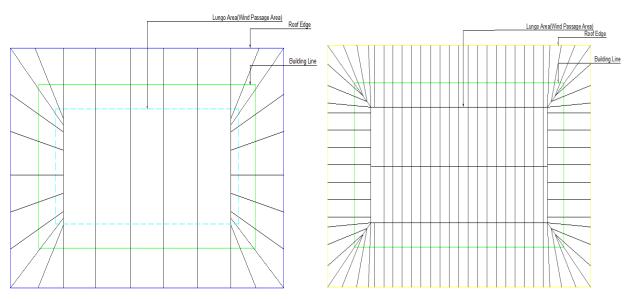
Hip + gable roof tie beam (left) and rafter (right) layout
